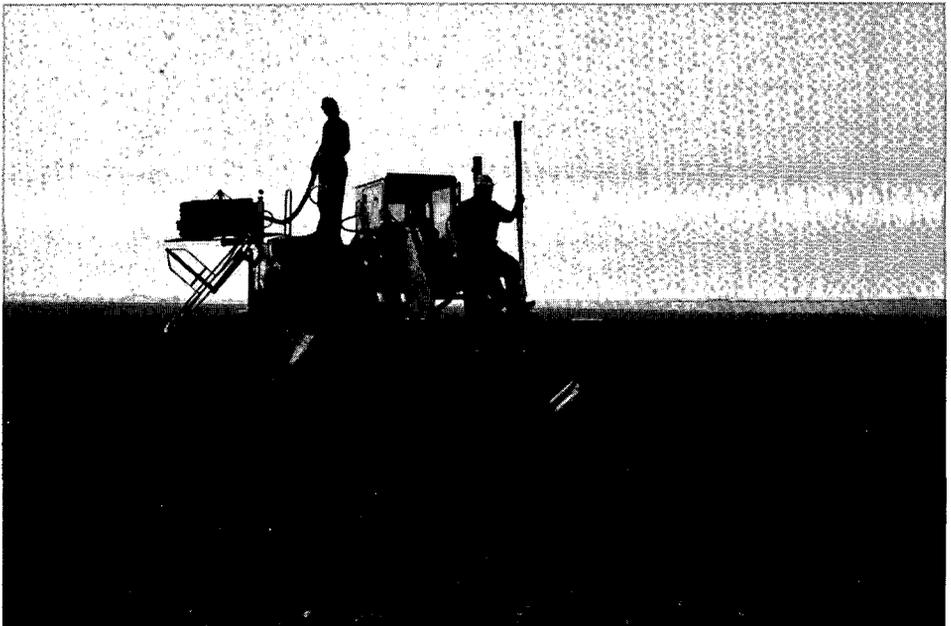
Trenchless drainage machine 'delta plough' installing prewrapped corrugated pvc pipe in The Netherlands. Maximum installation depth 1.8 m
